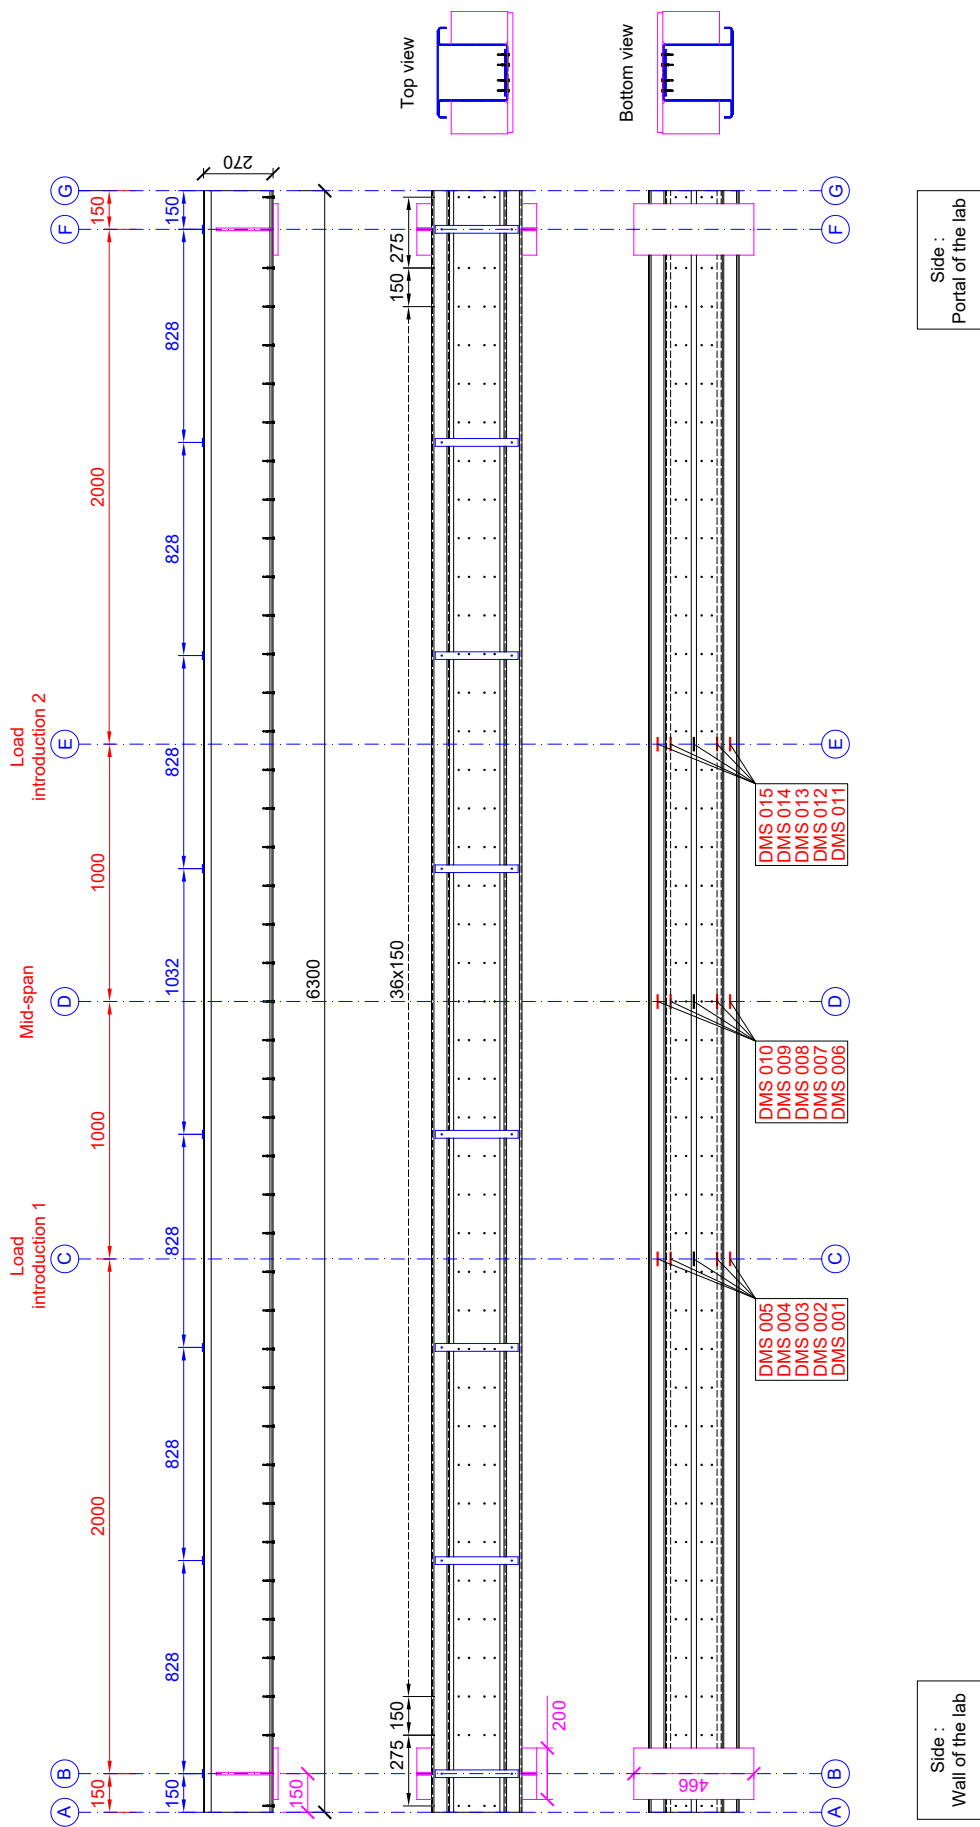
Layout of the steel beam specimen with the strain gauges
